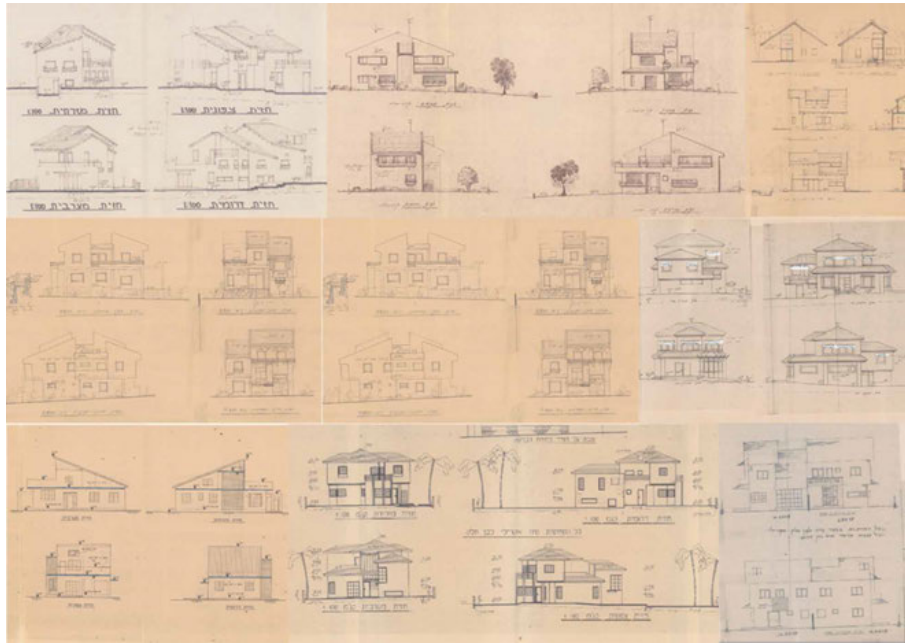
Low-rise private houses in Shoham, 1993-1995 (Shoham Construction Committee archives). Note that the short and closed façade is always the one facing the street
